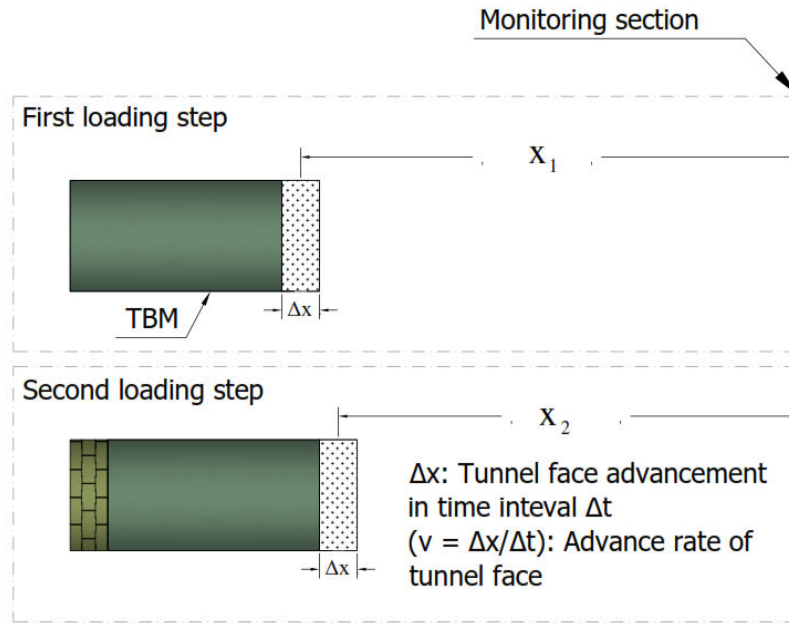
Shield tunnel face advancement toward monitoring section.
